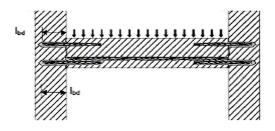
End anchoring of slabs or beams, designed as simply supported
